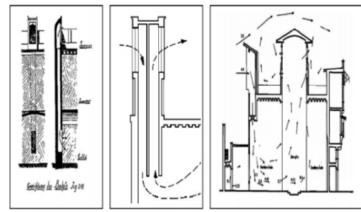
Scoop or "Air-Tunnel" which orients towards prevailing wind is used in traditional Muslims house for getting ventilation for all internal spaces of the house. This is a sketch for badgir used in traditional house in Cairo-Egypt, source: www. Hassan Fethi, www. Irak and Mahjob; 1997.
